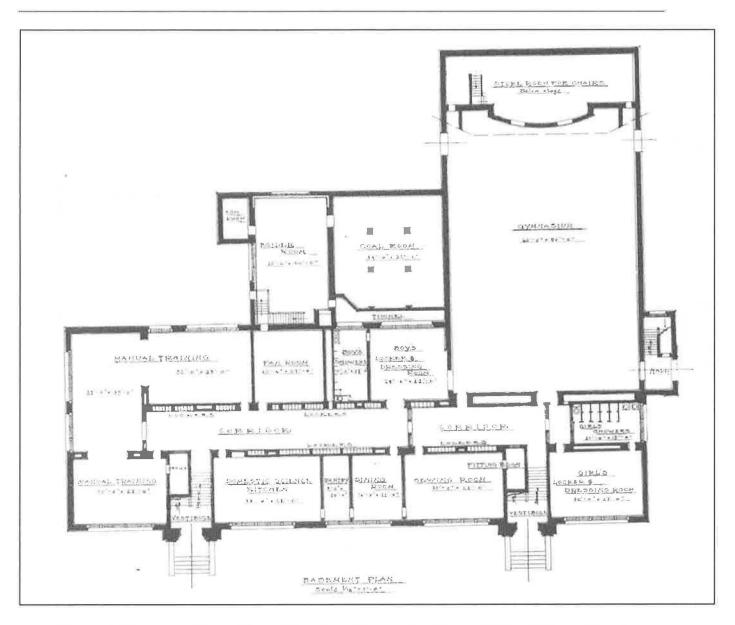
Basement/Ground Level Plan from Twenty-five Years of School House Planning
